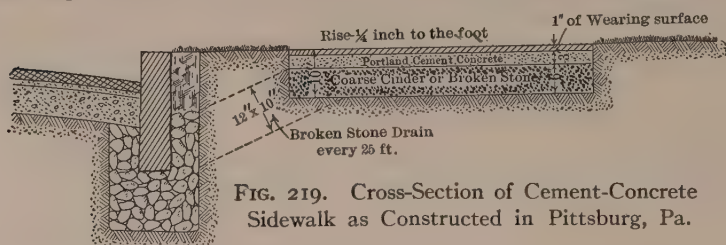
Cross-Section of Cement-Concrete Sidewalk as Constructed in Pittsburg, Pa.
